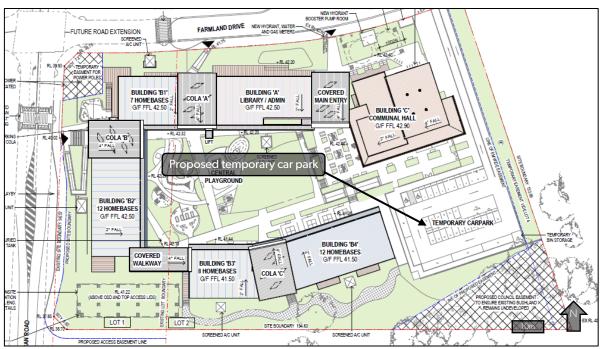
| Location of temporary on site car park (Base source: Applicant's SRtS2 2020)
